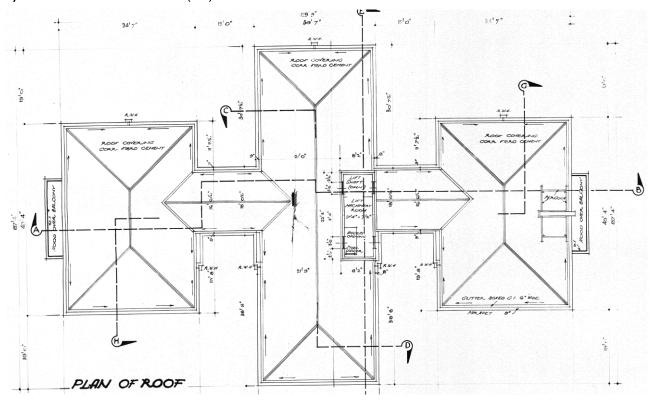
drawing for original seven storey design – roof plan (Source: BP, sheet 4)
